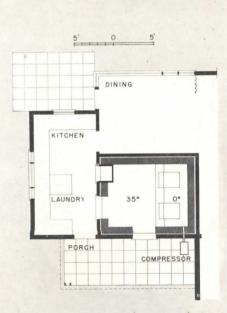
Suburban cold storage—freezer chest combination incorporating a built-in refrigerator. Both doors to the cold storage room would not be installed. The individual requirements of the cold storage would dictate which door should be installed. (Drawing courtesy "Home Freezer Handbook.")
